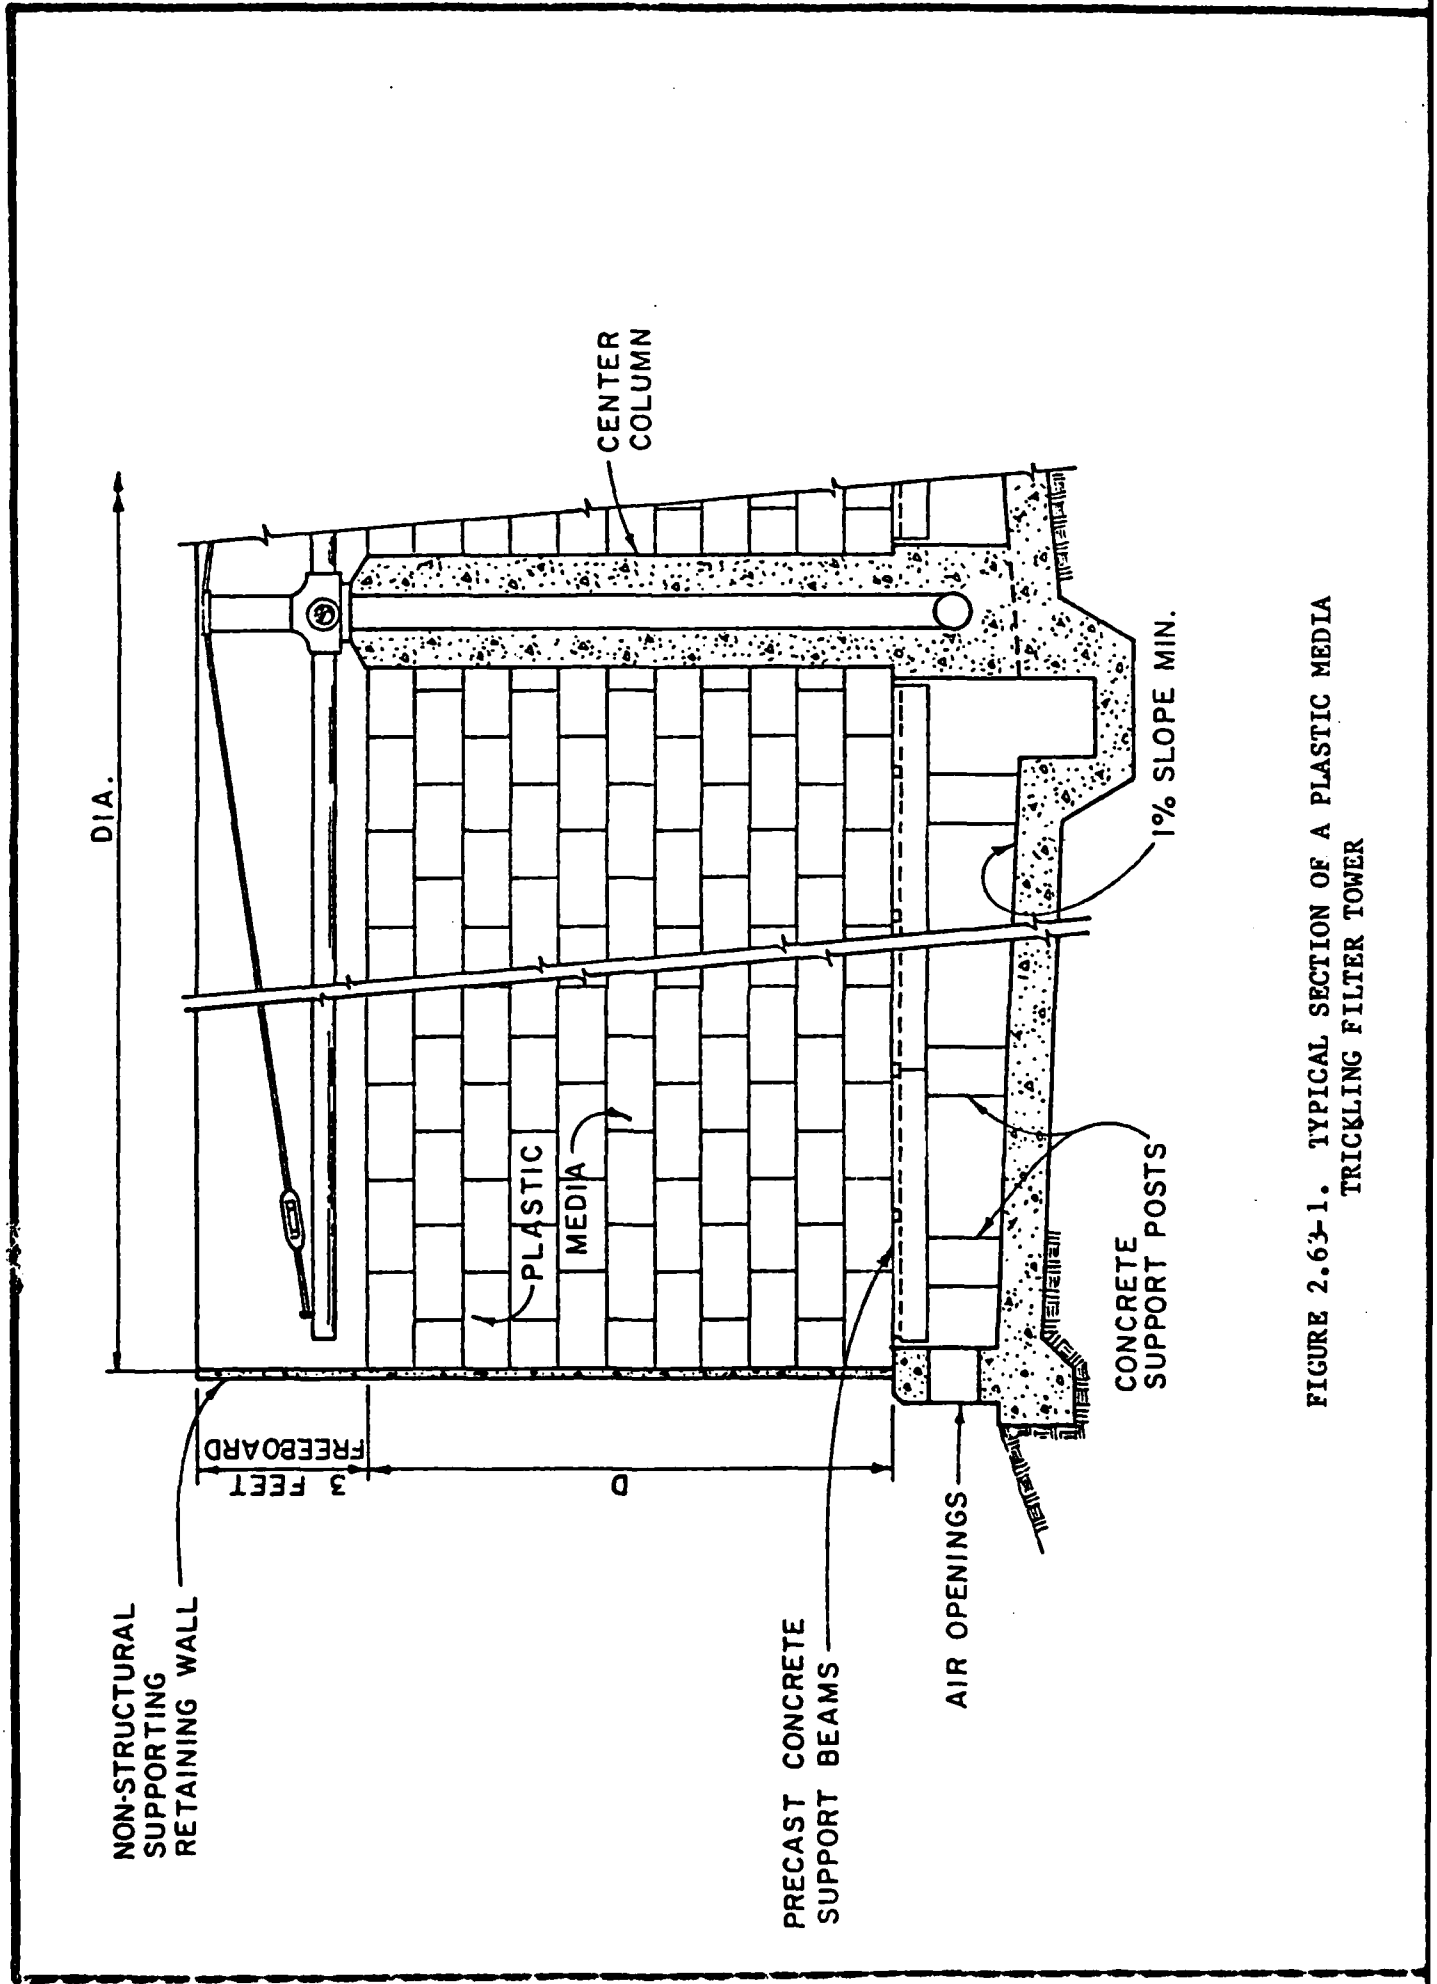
TYPICAL SECTION OF A PLASTIC MEDIA TRICKLING FILTER TOWER
